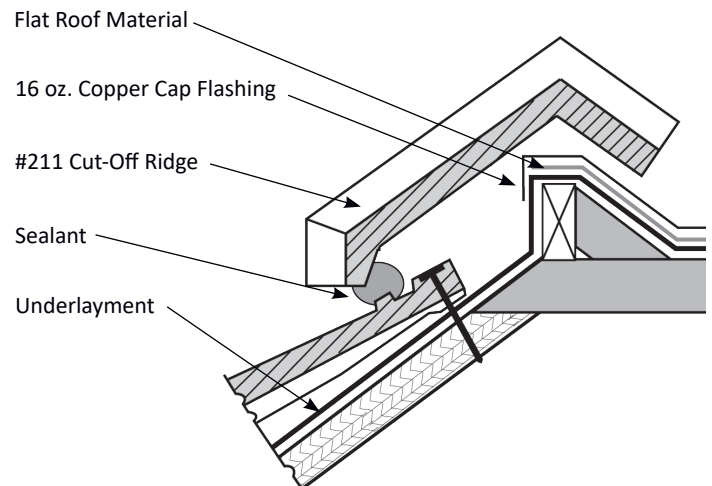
Deck Section with #211 Cut-Off Ridge
